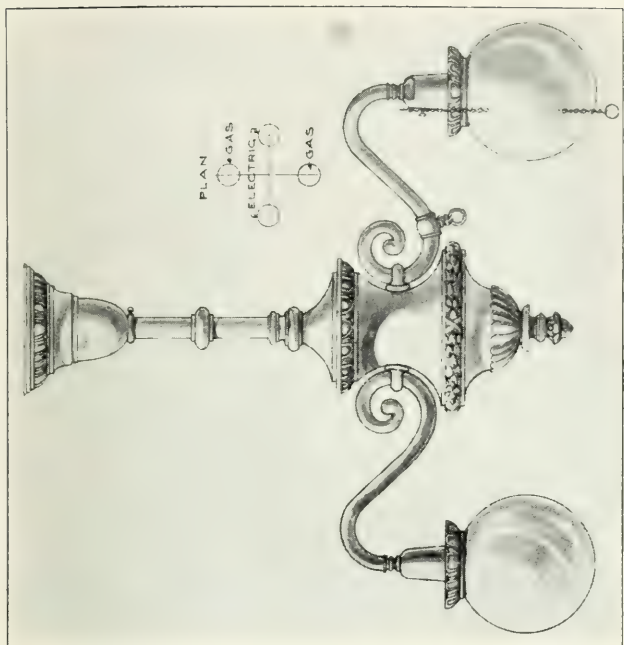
Adaptability of a gas burner to an ornamental fixture.
